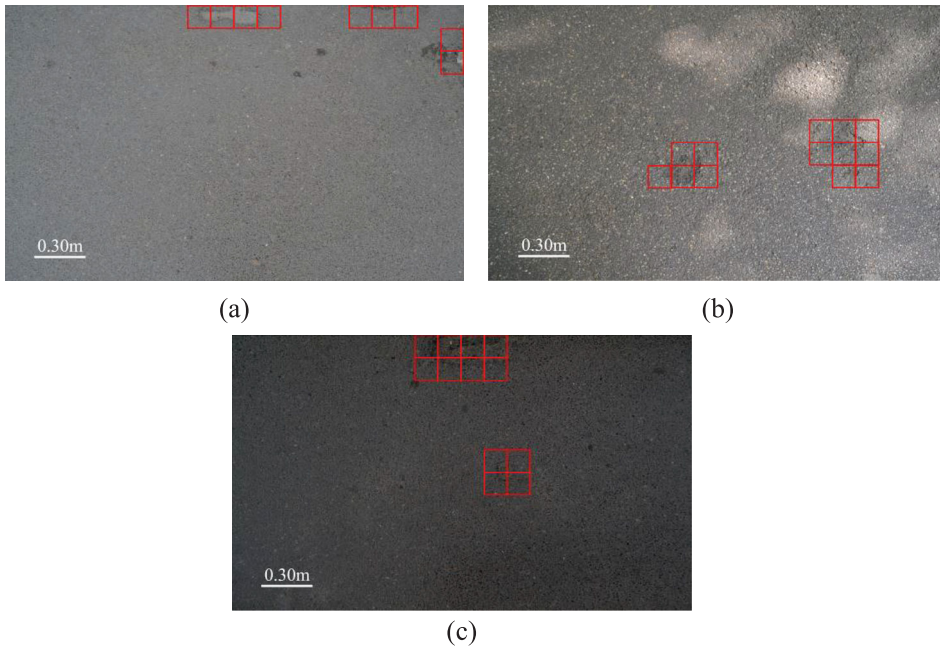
Examples of the Pre-pooling CNN detecting results with different light conditions. (a) The pavement under bright light condition (500 - 1000 lx), (b) The pavement under shadow light condition and (c) The pavement under dark light condition (5 - 300 lx).
